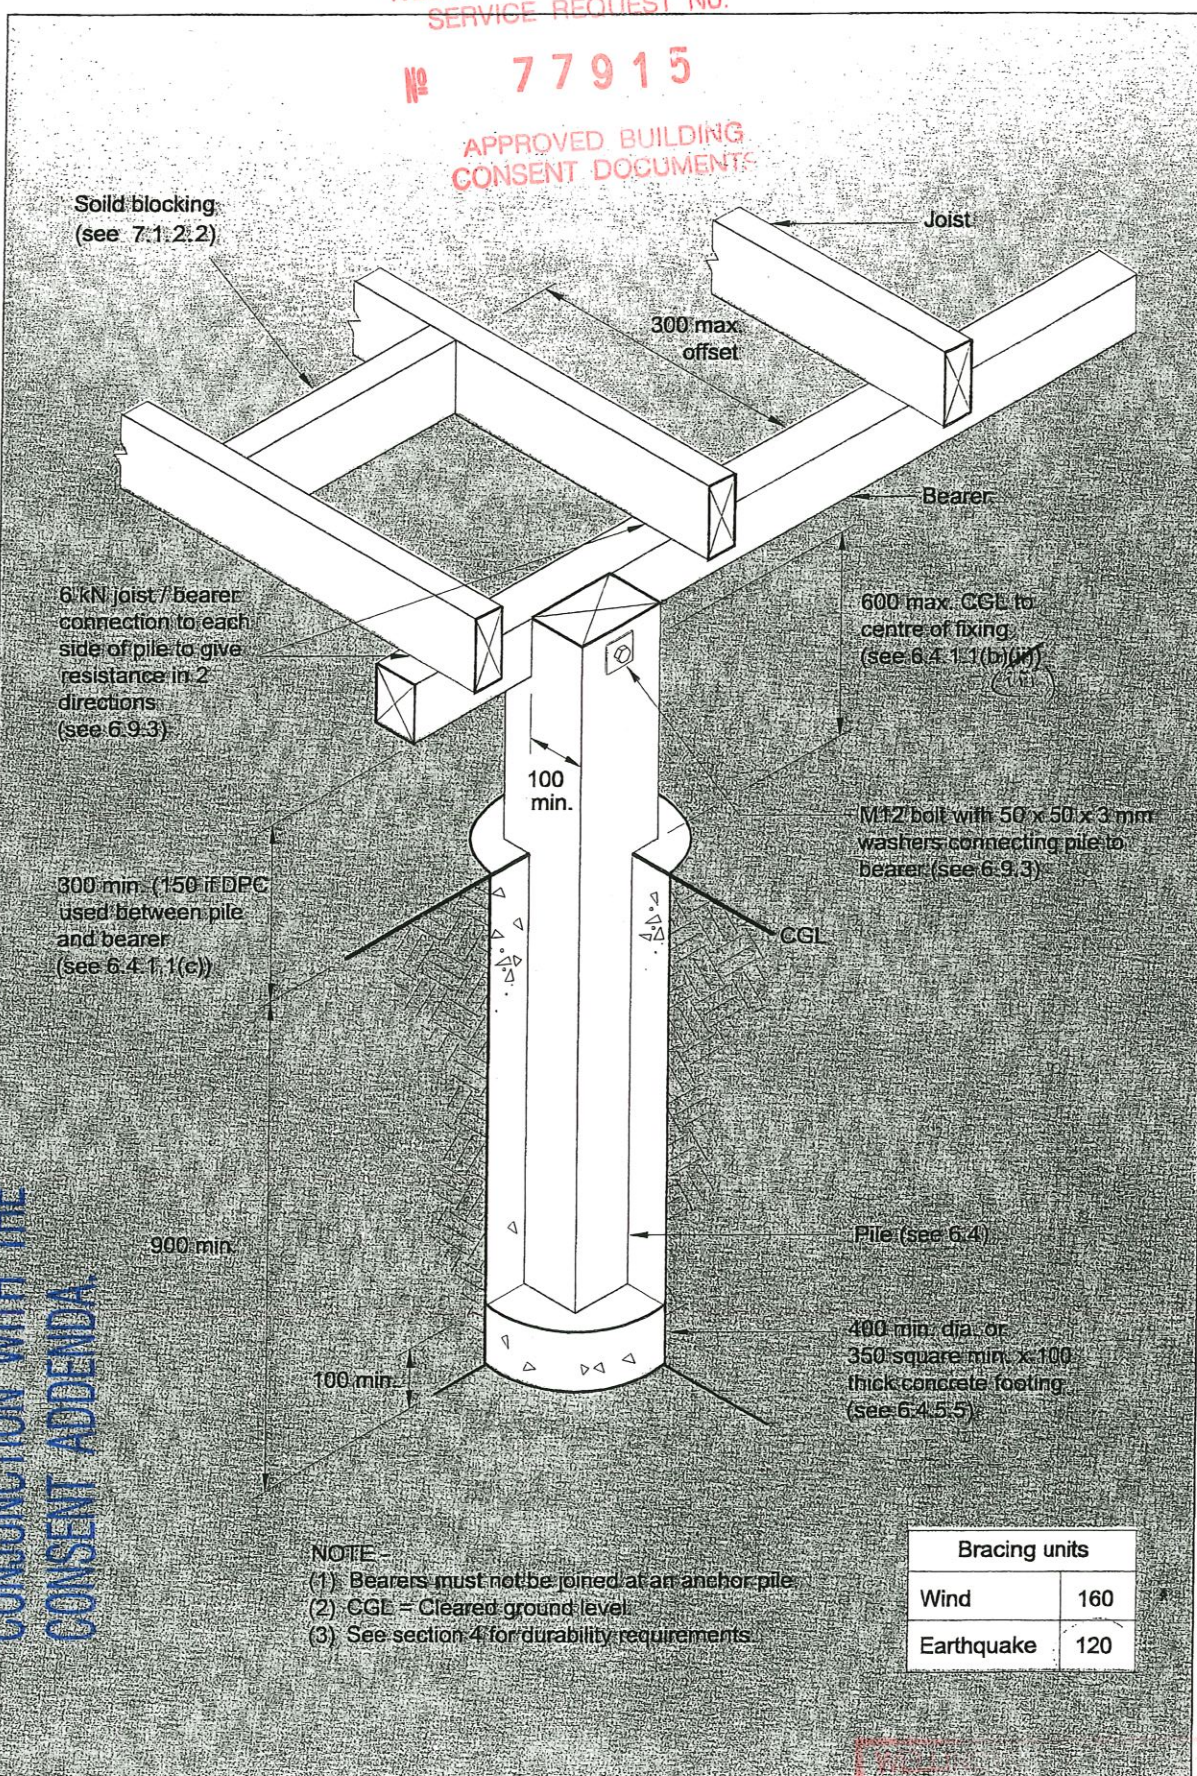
Anchor pile directly connected to bearer only (see 6.9)
